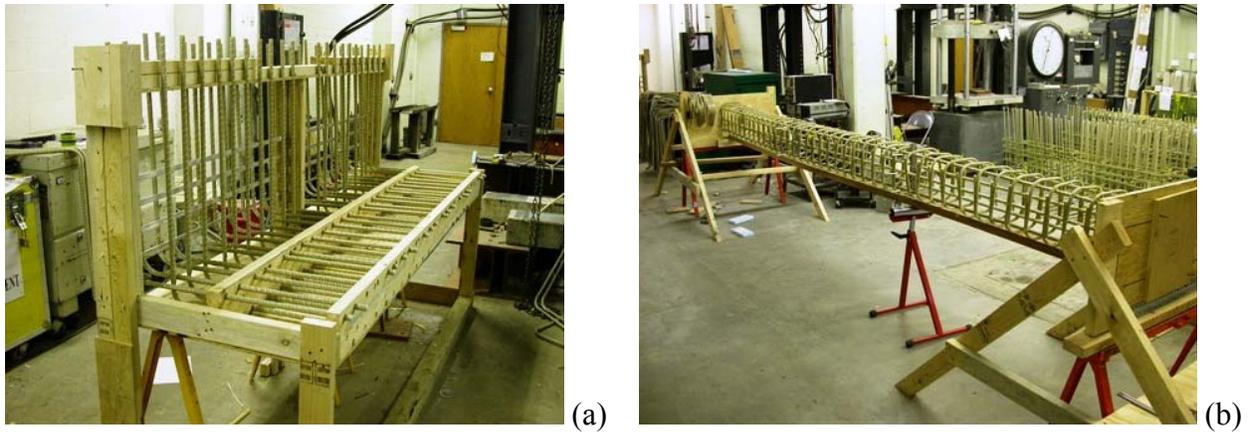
Shop preassembly of railing cages: posts (a) and longitudinal beams (b).
